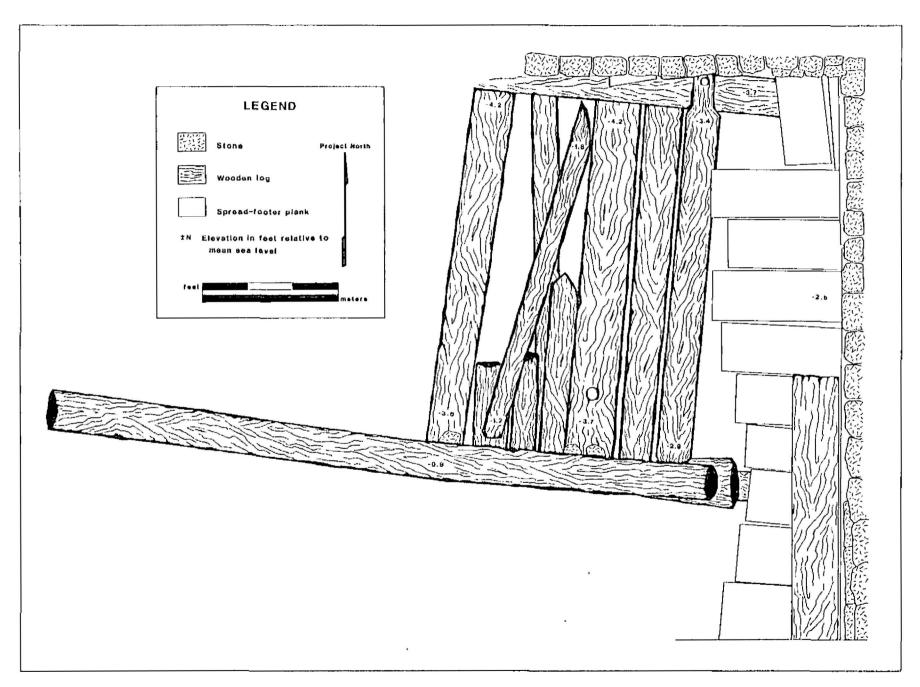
Plan view, Backhoe Trench I, Section 2, in Lot 47, showing top of "Cobb" wharf.
